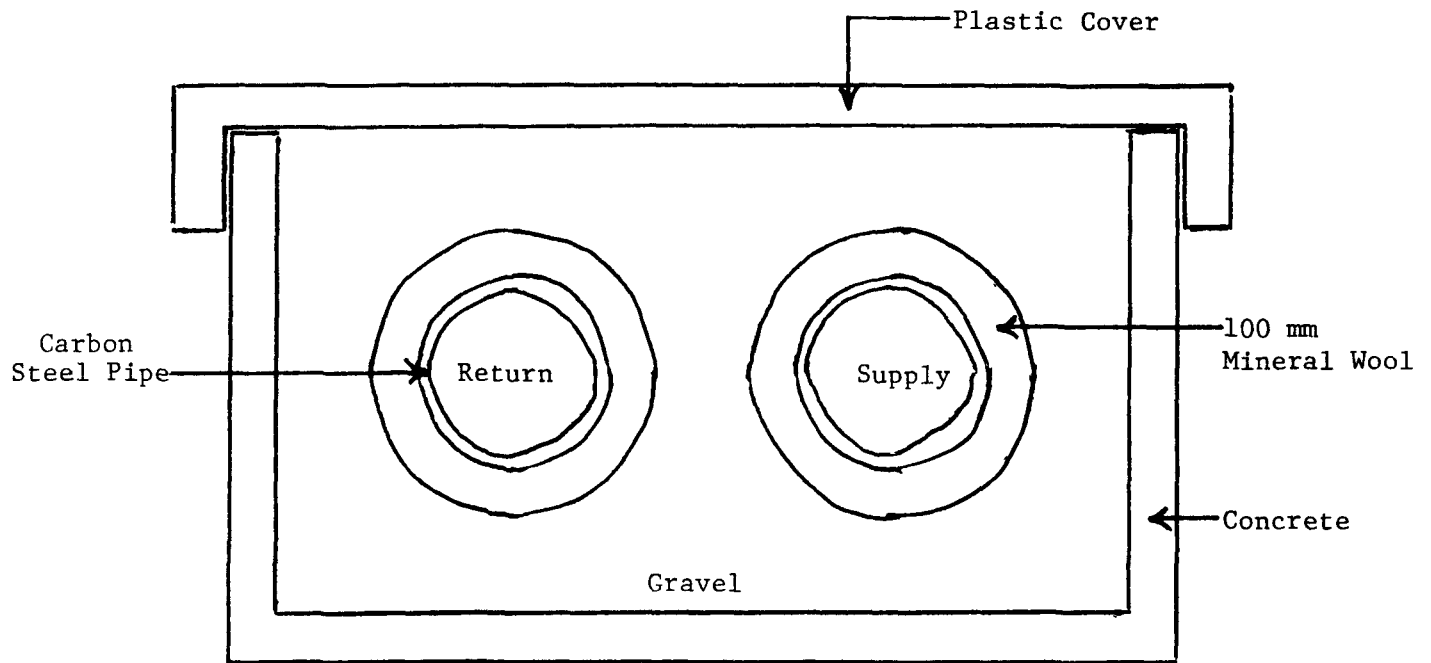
DISTRICT HEATING PIPE TUNNEL AT
